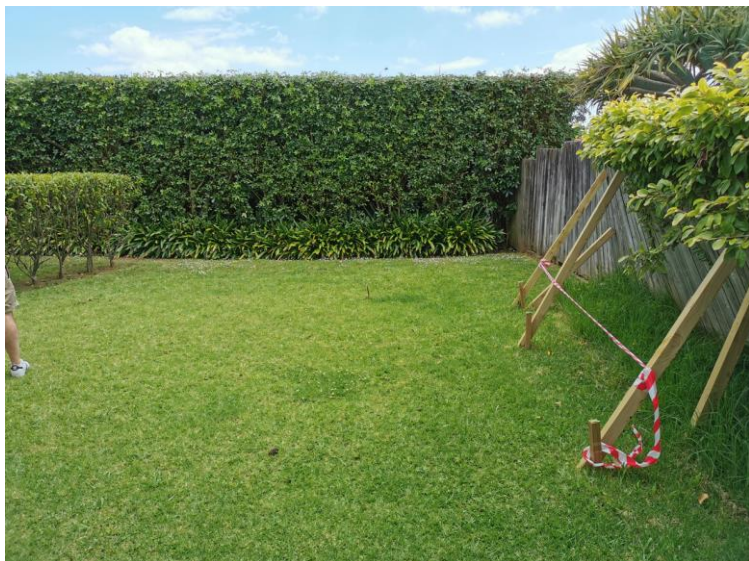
Western portion of 8 Kurahaupo Street, looking east.
